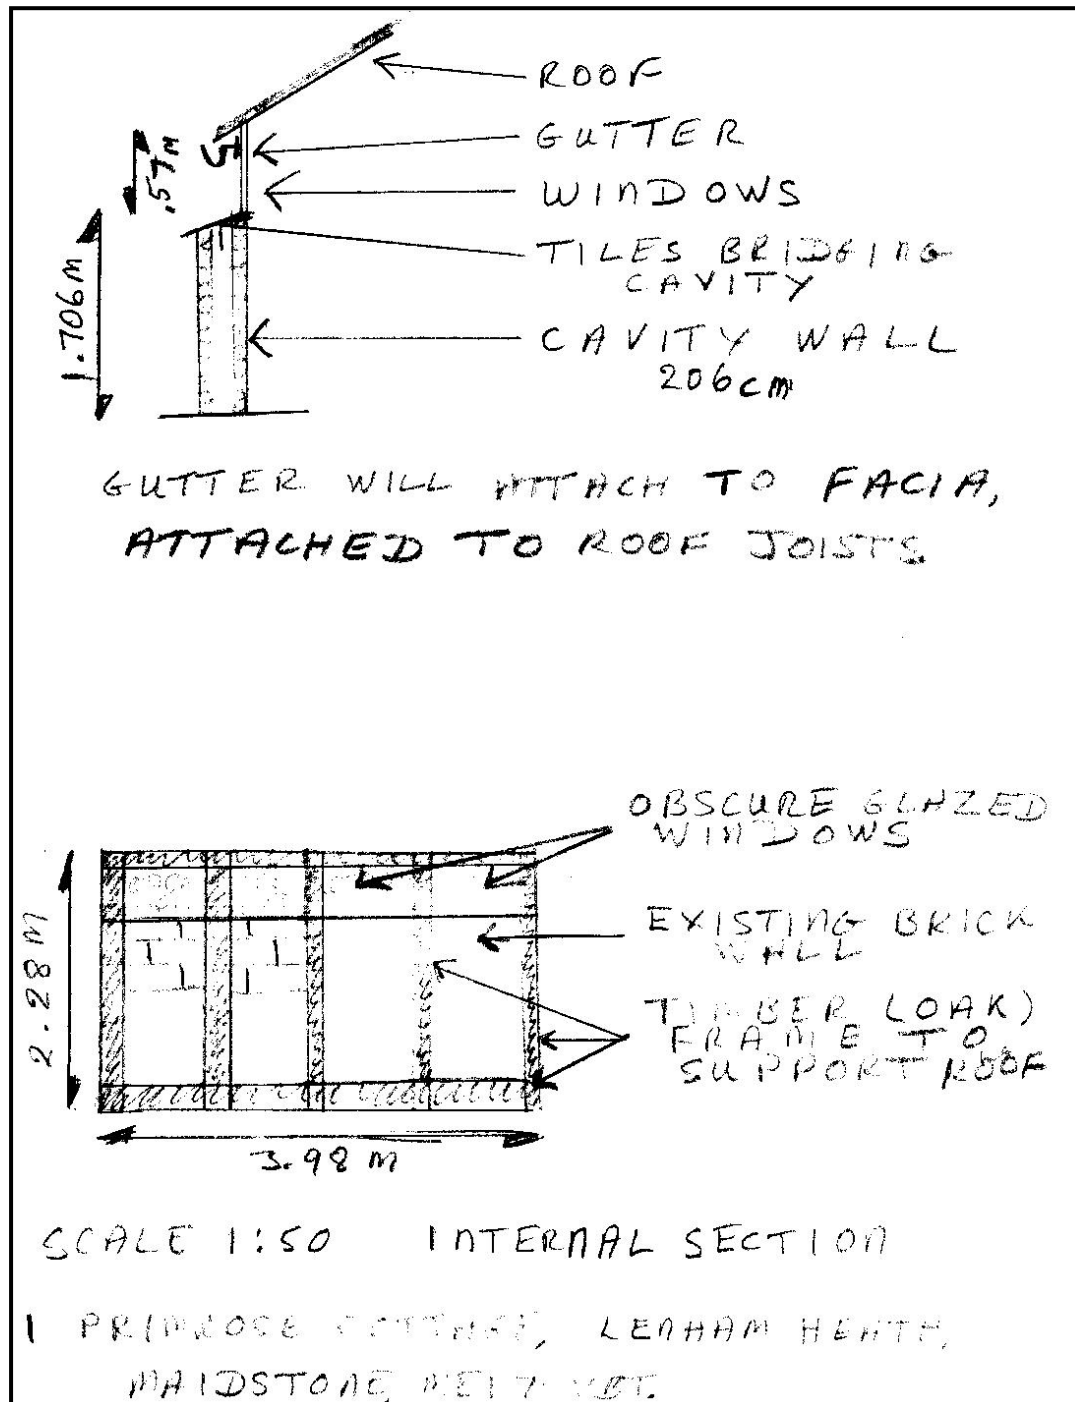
Proposed amended elevation treatment and gutter design on elevation facing the neighbour to the NW. The revised elevation treatment will remove the existing blockwork located above the existing brick built boundary wall and will include windows that will be recessed on the inside of the boundary wall. In turn, this will allow for the proposed gutter to be located above the wall and would not cross over the boundary wall.
